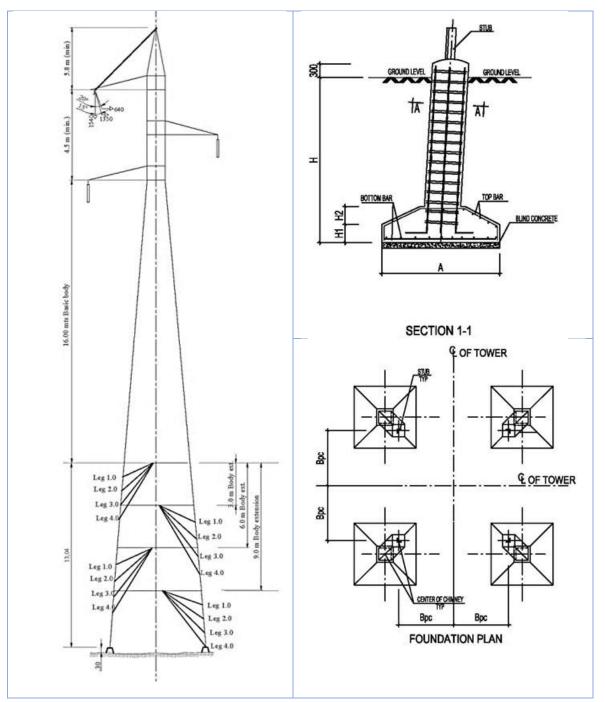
Drawings of Typical 132 kV Tower Type (left) and Tower Foundation (right)
